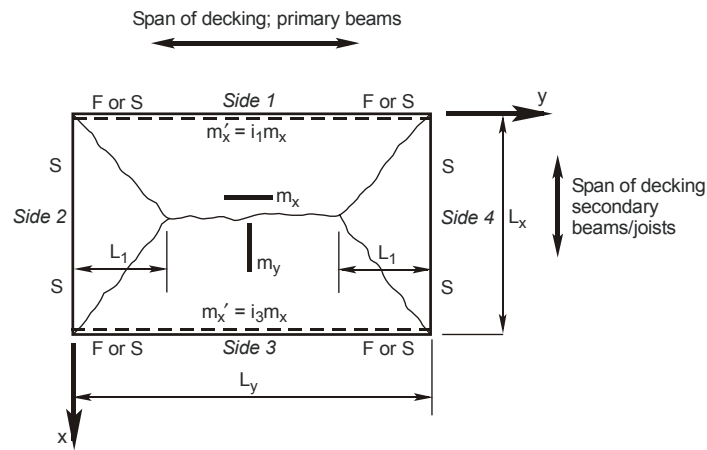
Reflected Floor Plan for Application of Slab Panel Fire Engineering Design Procedure to a Concrete Slab on Profiled Steel Deck Supported on Primary and Secondary Beams
